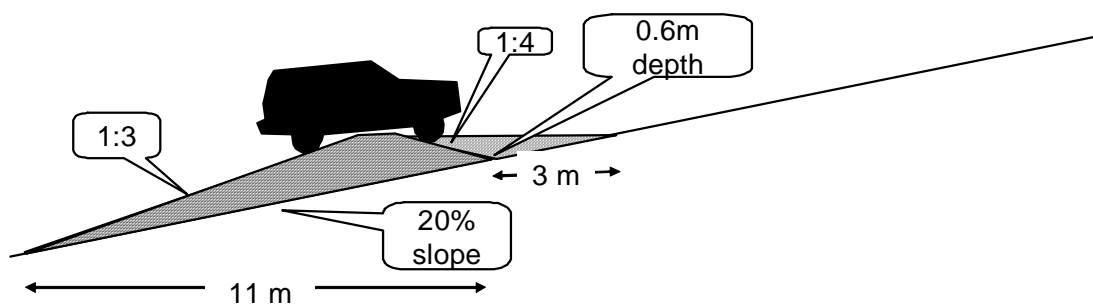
A 60cm high whoa-boy constructed on a 20 per cent slope by importing road building material.
